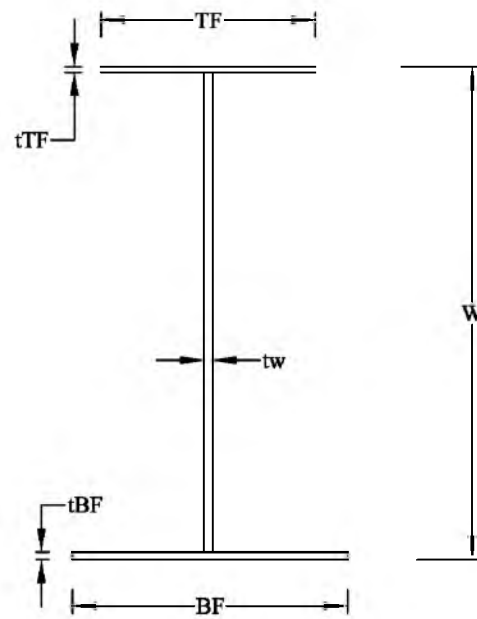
Section of steel girder used in the curved bridge (see Table A.2 for details)
